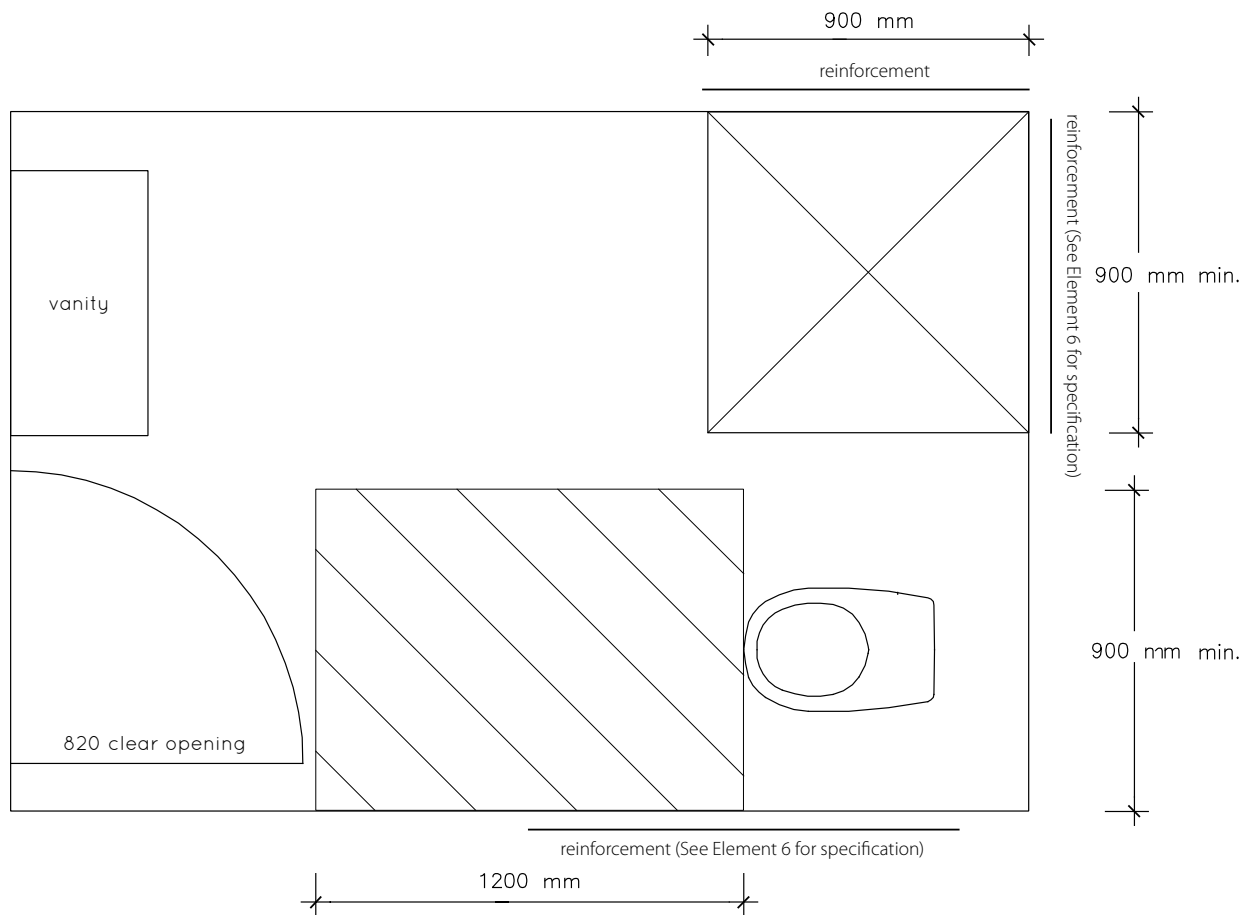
(b) Silver level ground (or entry) level toilet layout and space requirements in a combined bathroom.
